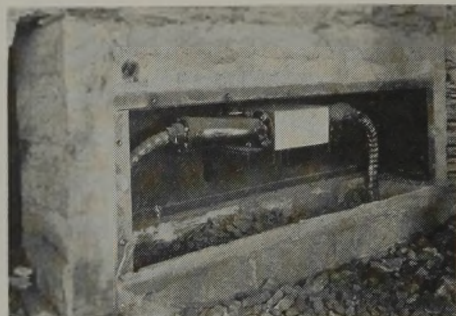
Cable-Plug-Connection Housing in Heading Rib, Cover Removed
